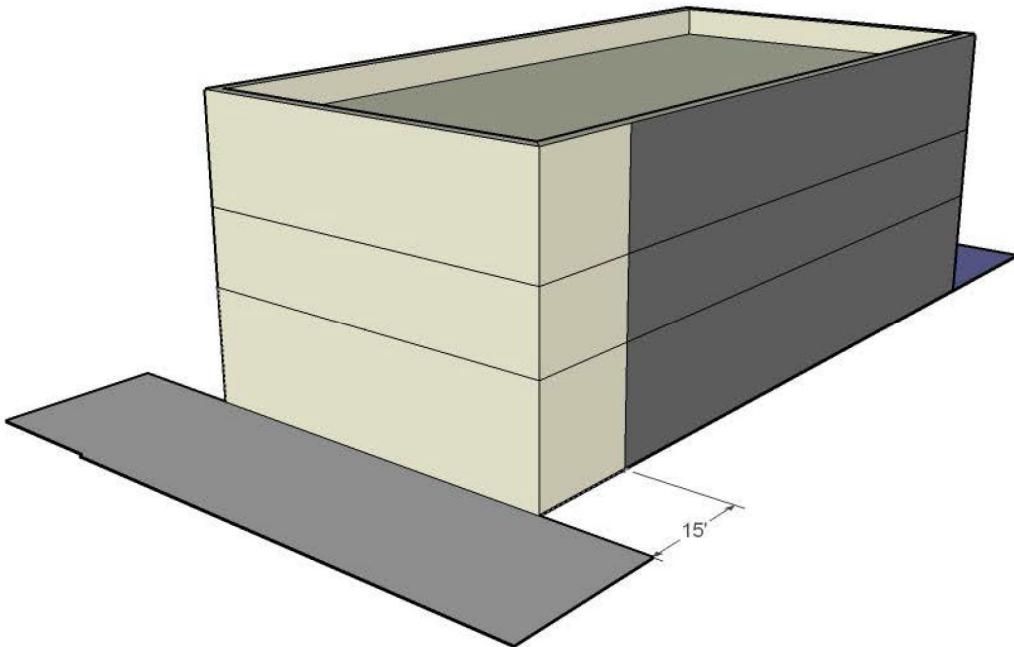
The side facade material must match the front facade material for a length of at least 15 feet
